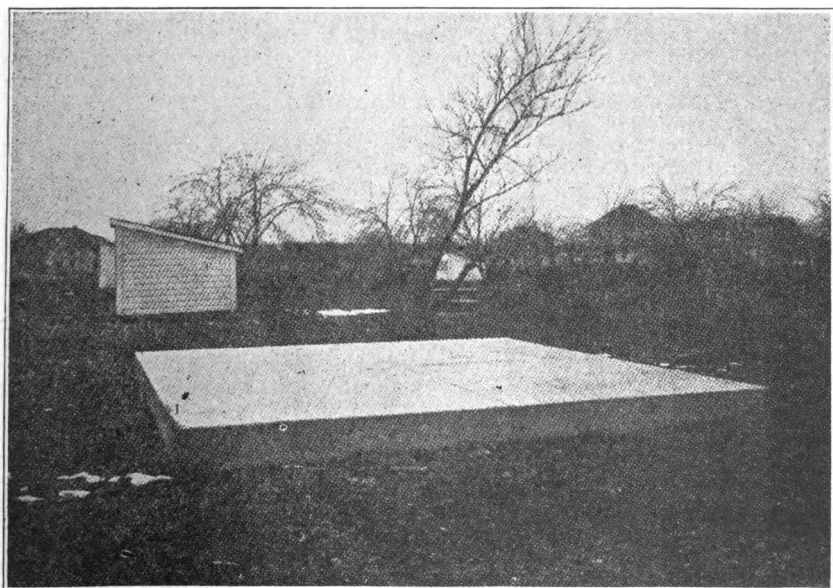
A finished concrete floor and foundation ready to receive a fool-proof poultry house 14x14 ft.
